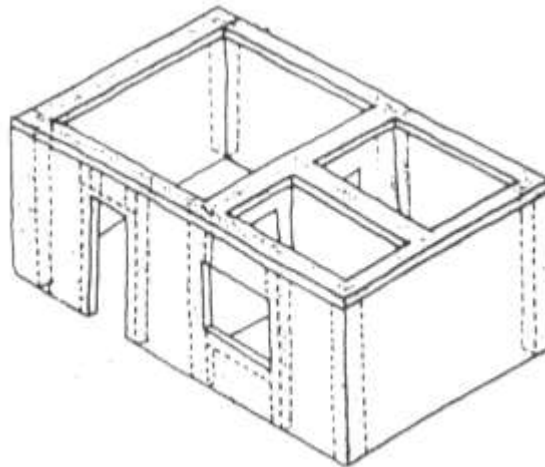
Example of a ring beam (sometimes called a bond beam)
